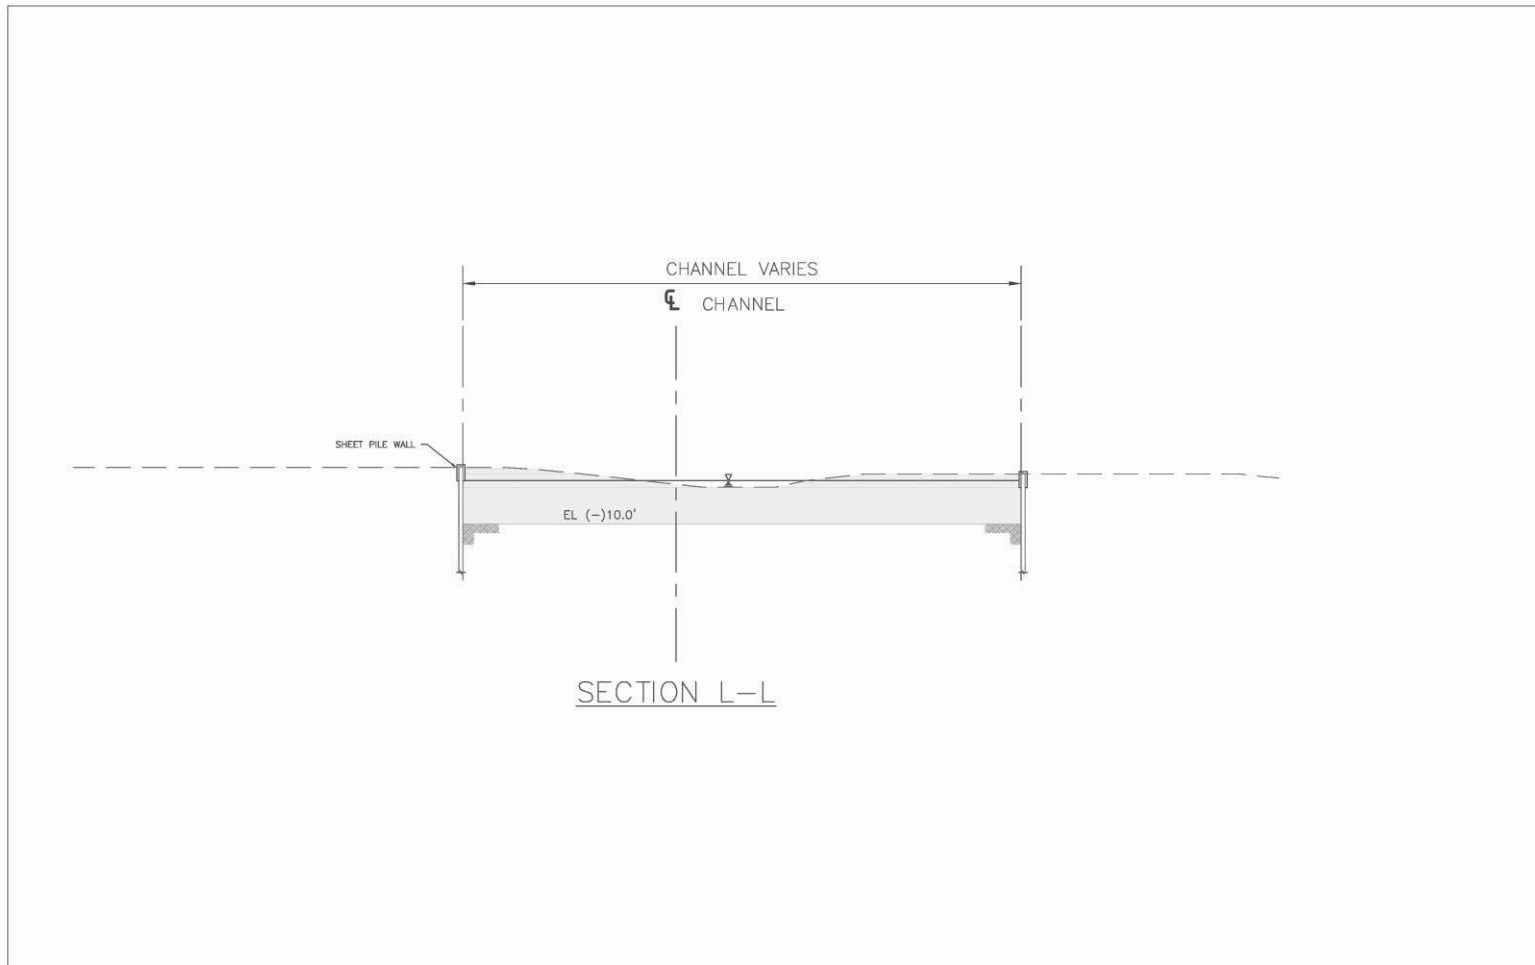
Cross Section L-L, Dr. Barbosa Avenue Bridge
